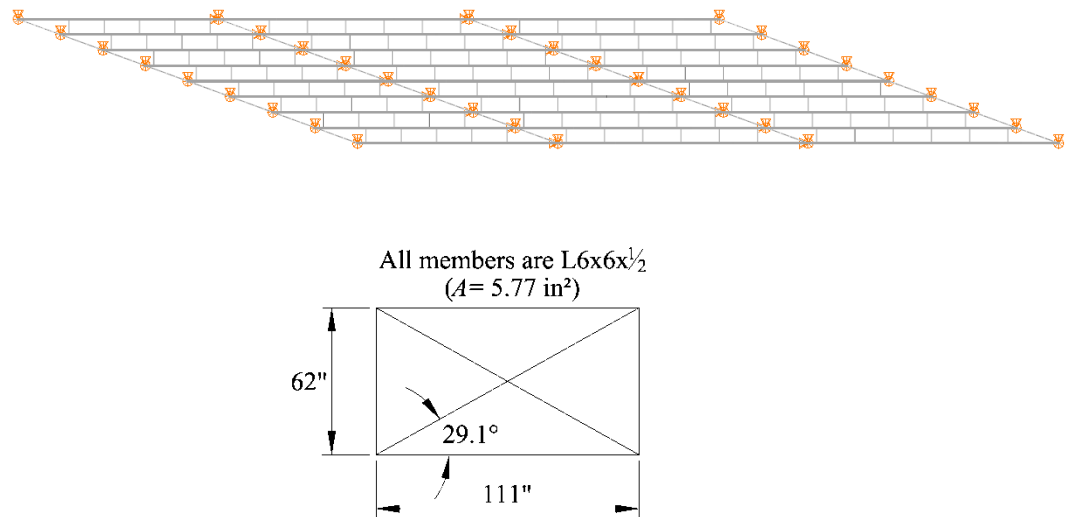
Plan view of NICSS16 and cross-frame dimensions
